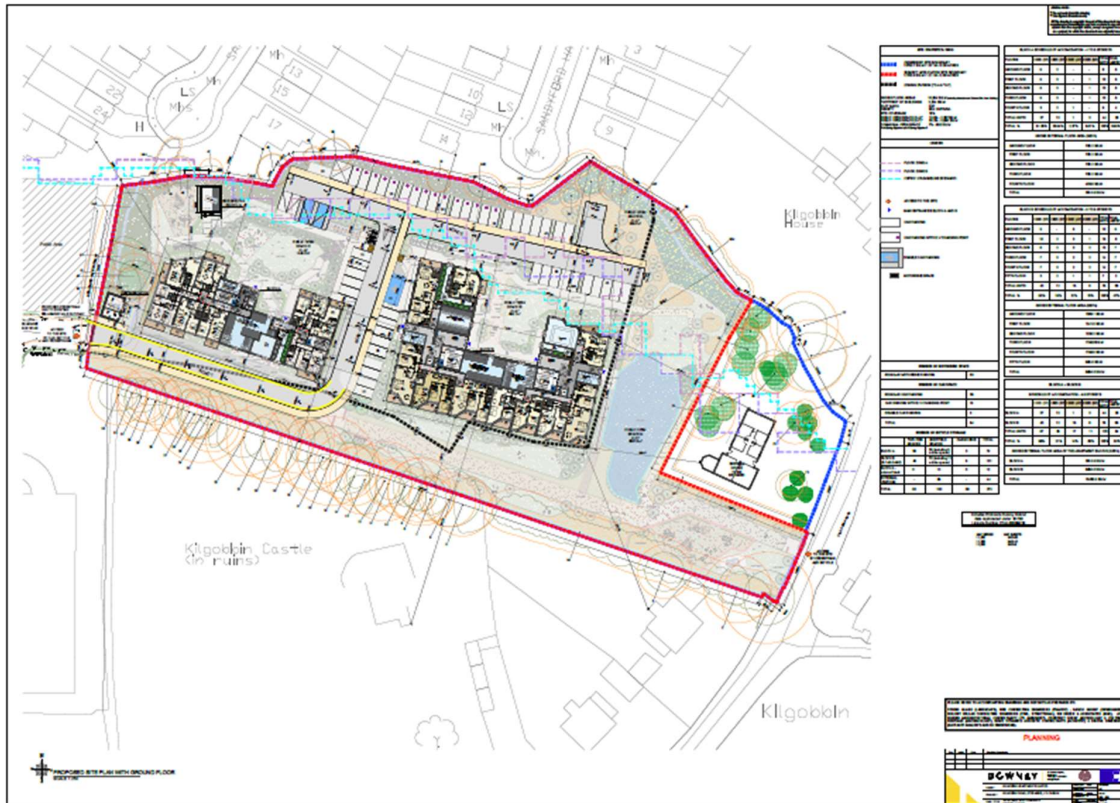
Proposed Development Site Layout (Downey, 2025)
